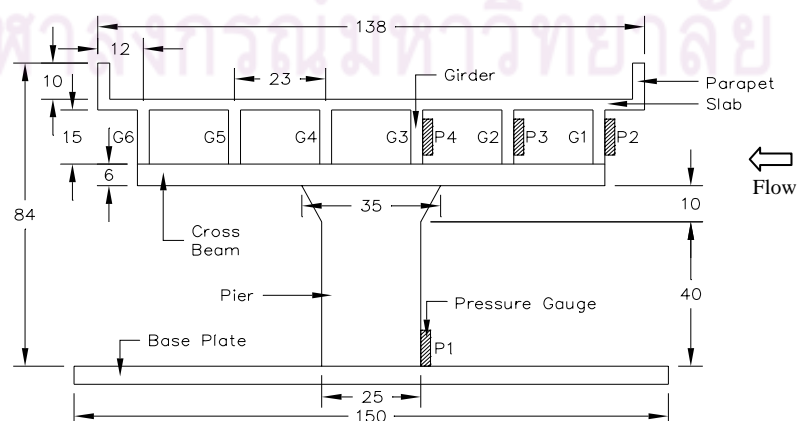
Typical cross-sectional view of bridge model (Unit: mm)
